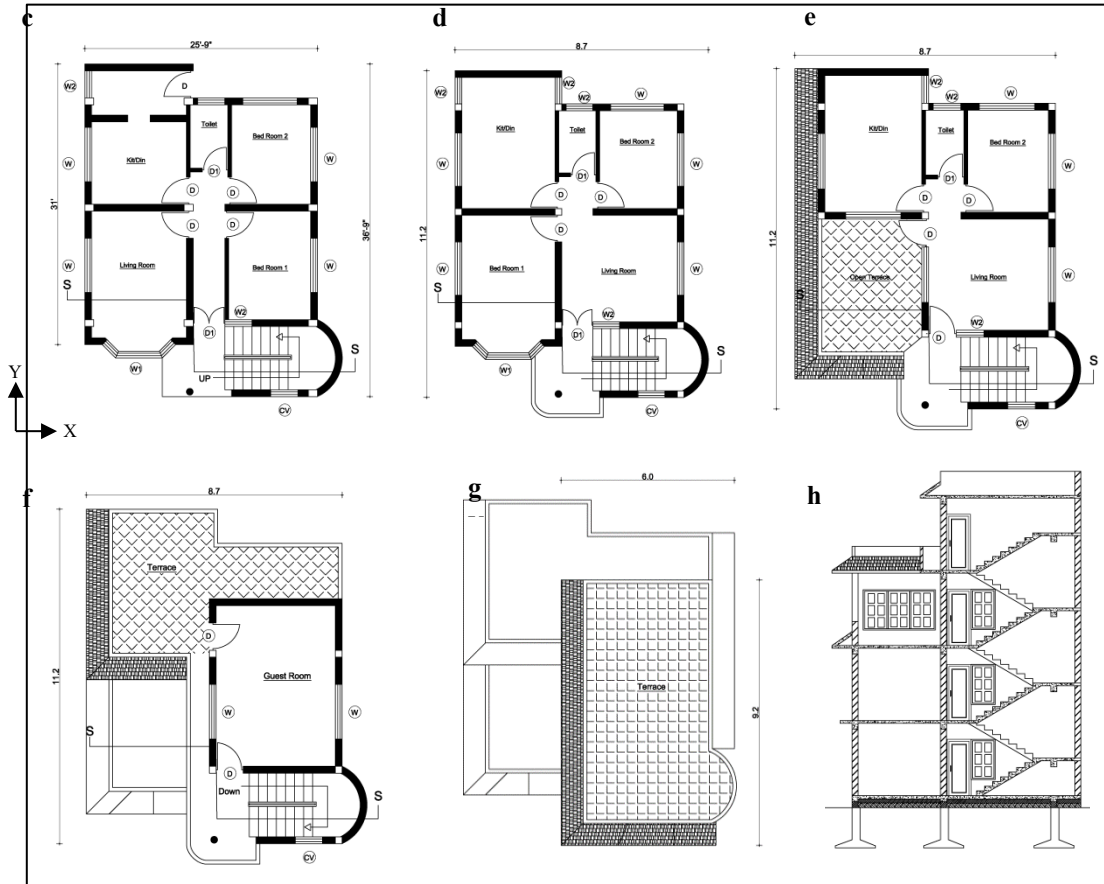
Existing plan view of building with solid brick as an infill wall: Ground floor (c), Second floor (d), Third floor (e), Fourth floor (f), Roof (g) and Section (h).
